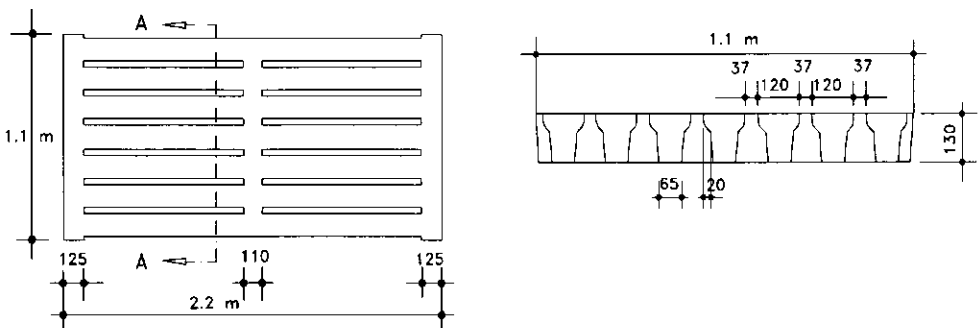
Top view and cross section (A—A) of the slatted floor element (except for length and width, all measures in mm).
